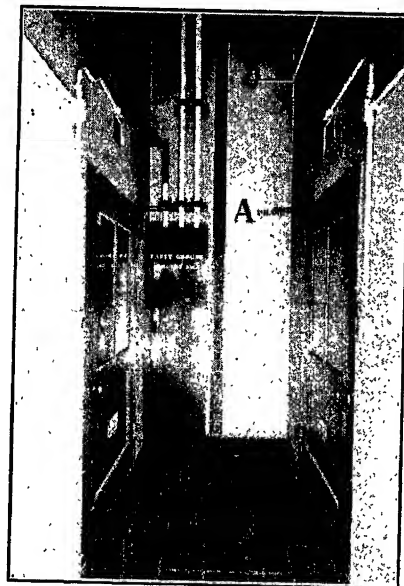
BUILDING SPLIT AND RISERS ON "A" PHASE FLOORS
